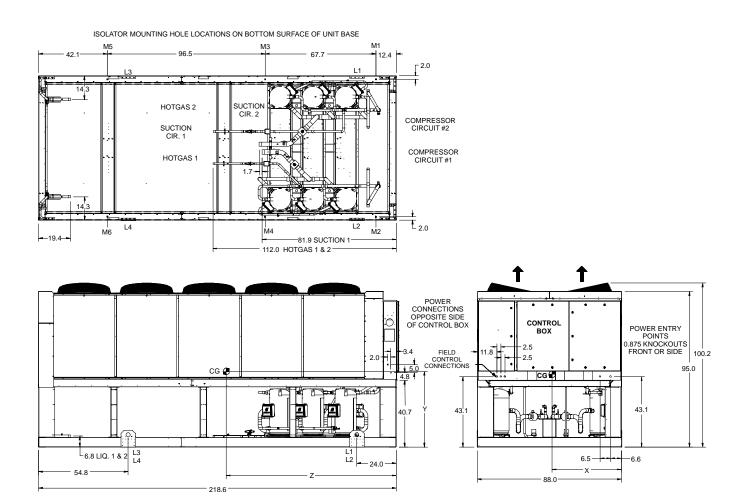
, Dimensions, AGZ 100CB - 130CB, w/Remote Evaporator
